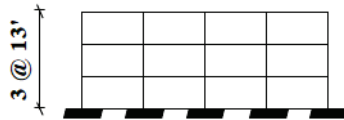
Baseline SDC B_{\max} steel moment frame building typical 3-story elevation.
